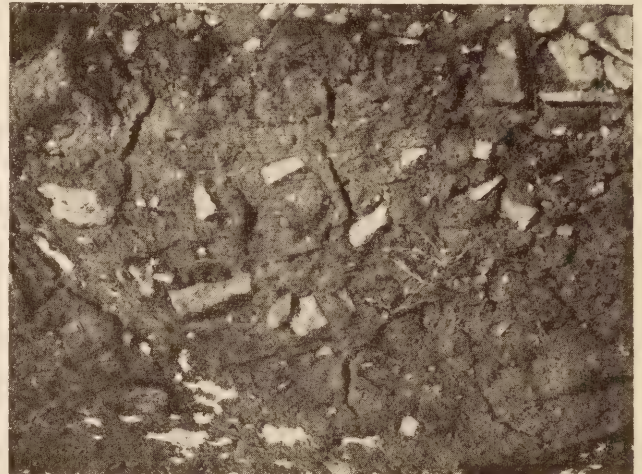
TYPE OF SHRINKAGE CRACKING LIKELY TO OCCUR WHEN WATER IS DRAWN OUT OF SOILS DUE TO FREEZING IN ADJACENT AREAS
